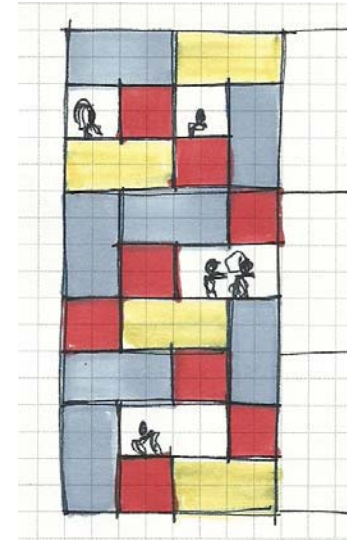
Sections are left open to take advantage of the views to the south
